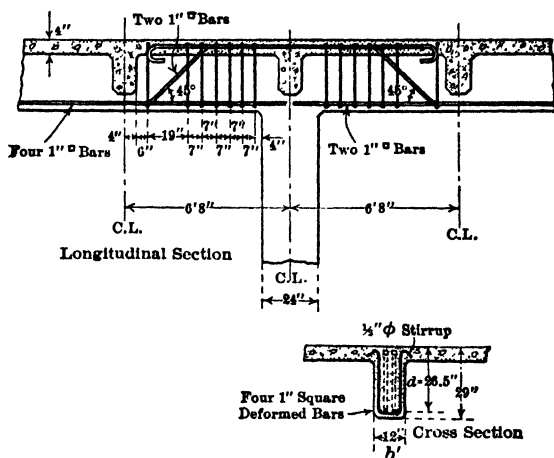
Typical Design of a Reinforced-Concrete T Girder
